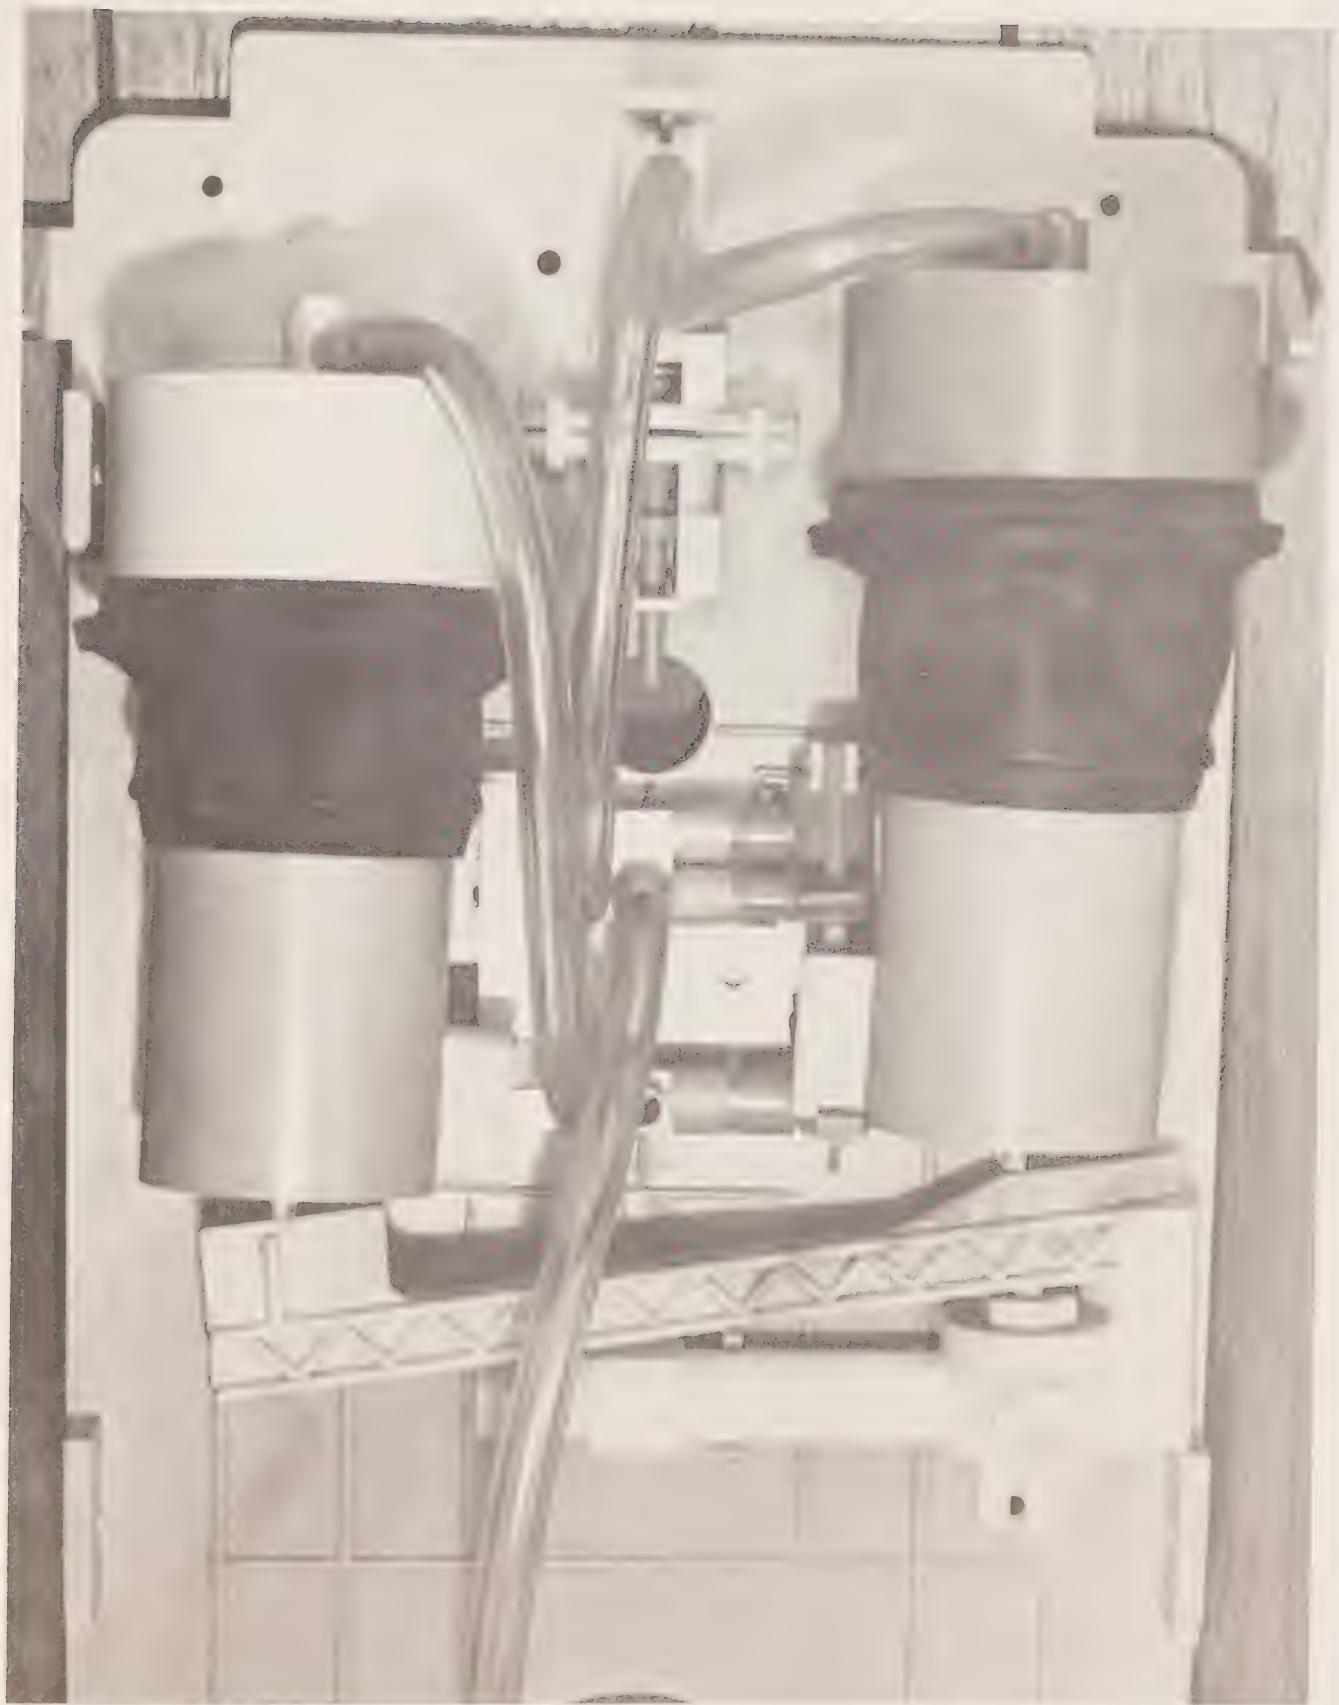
VACUUM TOILET FLUSHING MECHANISM
